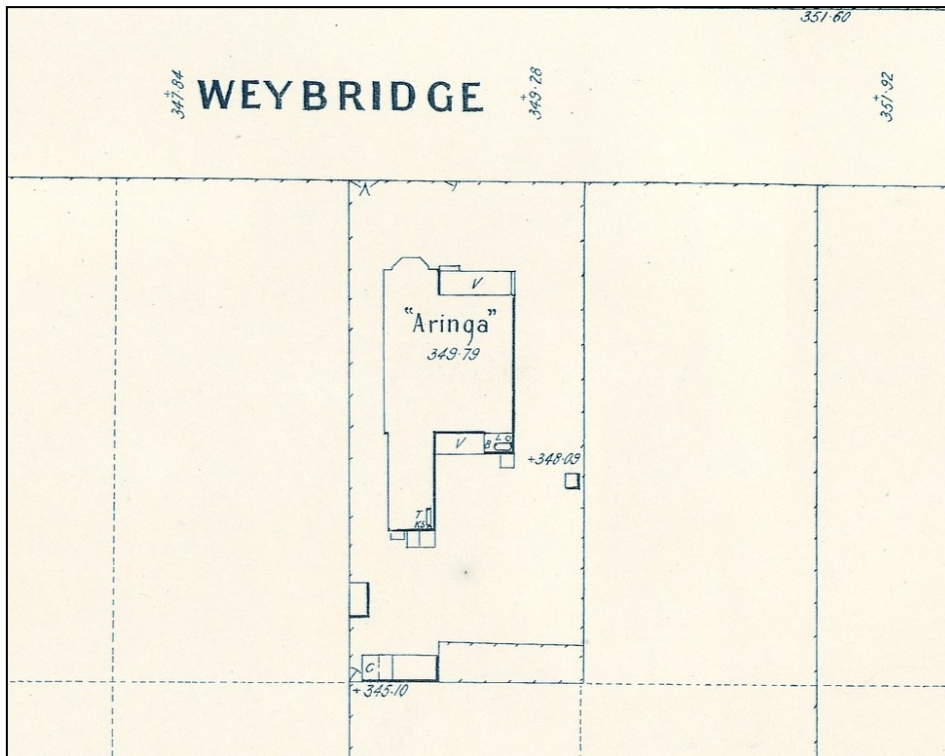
Detail MMBW plan 2208 of 1912, with subject property at centre. North is at top. Note that the return verandah has not been added yet, nor have the bay windows to the two side elevations.
